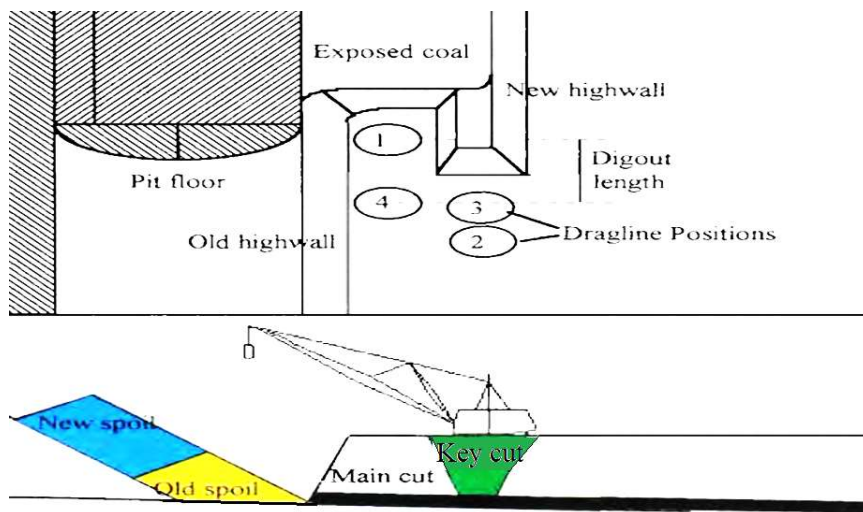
Plan and sectional view of simple side casting method (Mirabediny,1998).
